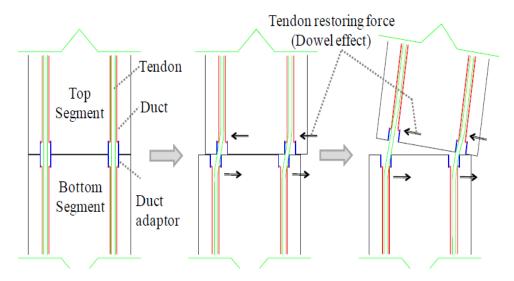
Segmental column connection with sliding joints tested at the University at Buffalo
